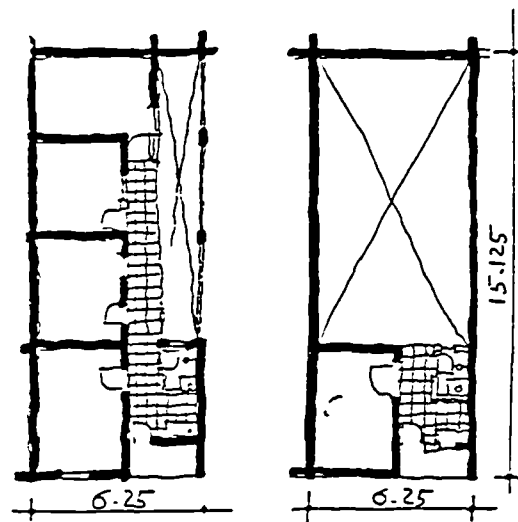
10th Ramadan Core House. Initial Provision and Type plan.
